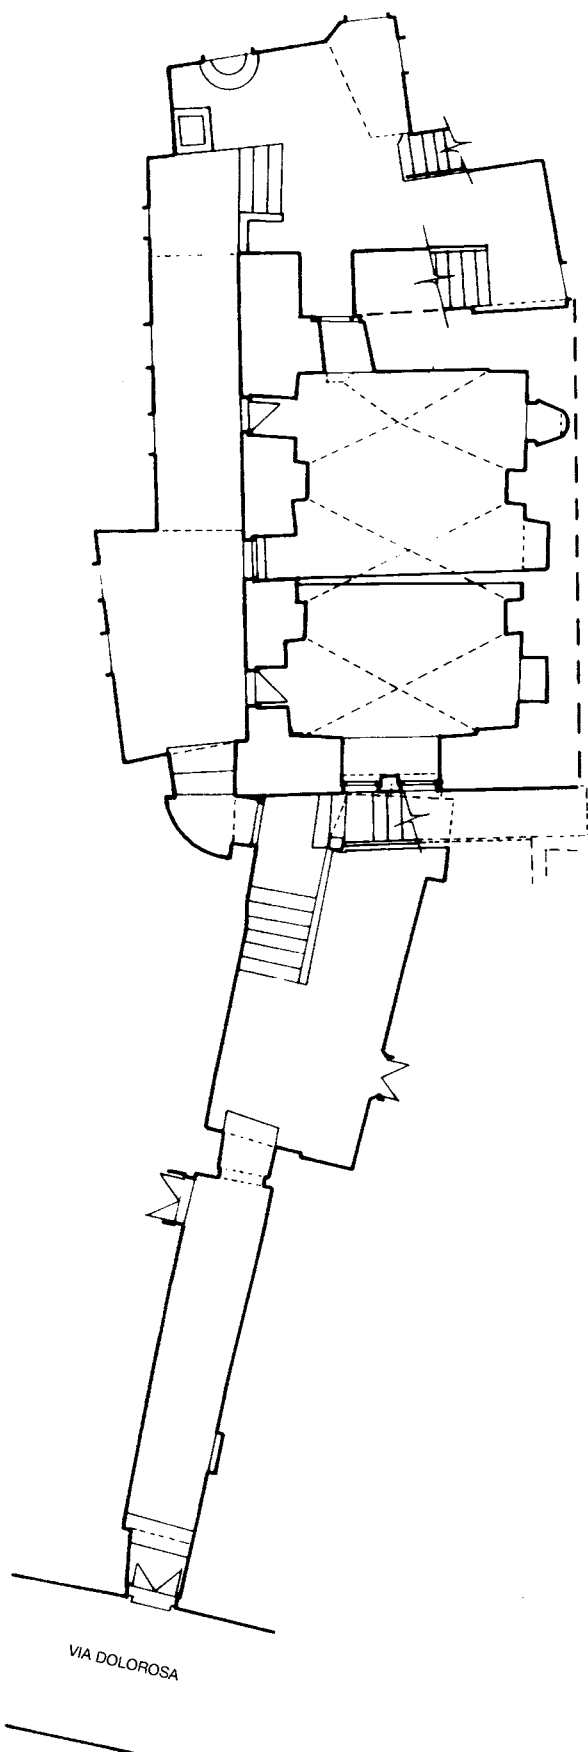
House on the Via Dolorosa, first floor plan, the 'Salamlik'.
